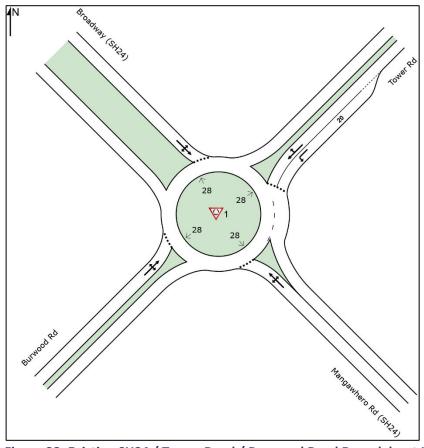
Existing SH24 / Tower Road / Burwood Road Roundabout Layout
